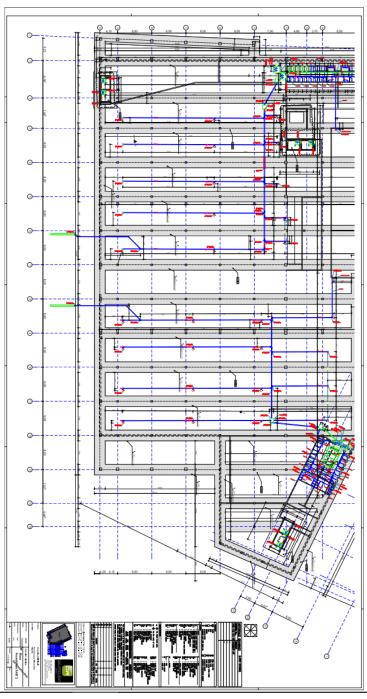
AIP Foundation (Part 1 Sheet 23)
